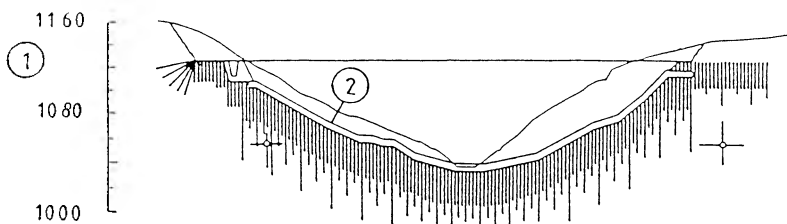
Inamura dam, Japan 1982. Well shaped core foundation after deep excavation of soil and weathered rock (adapted from Nakayama et al. 1982).
